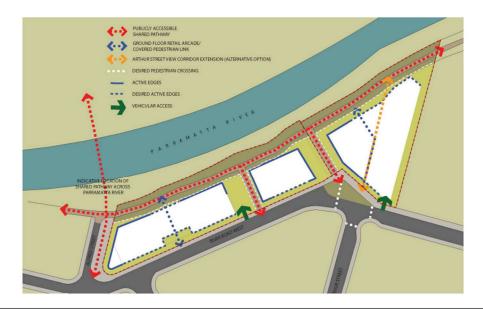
Pedestrian Links and Laneways
